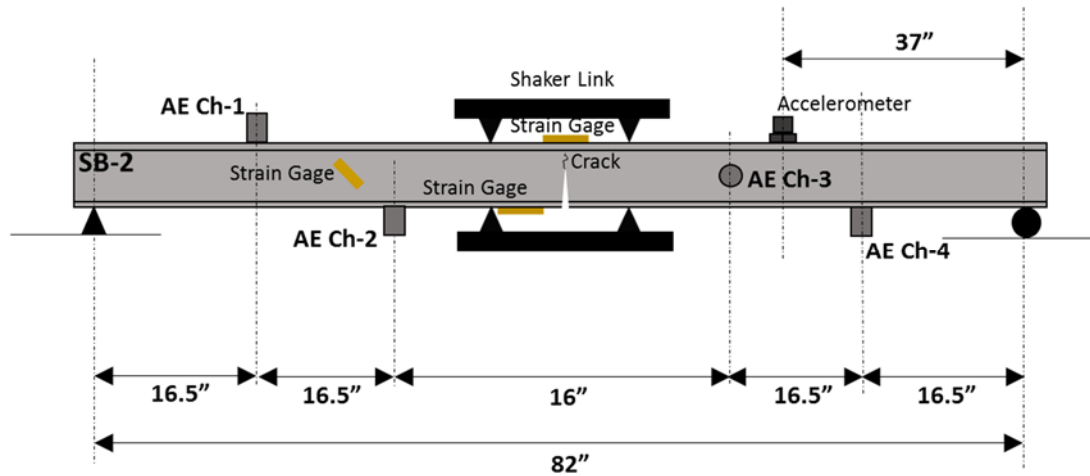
Locations of gages, transducers, accelerometer and crack in beam SB-2.
